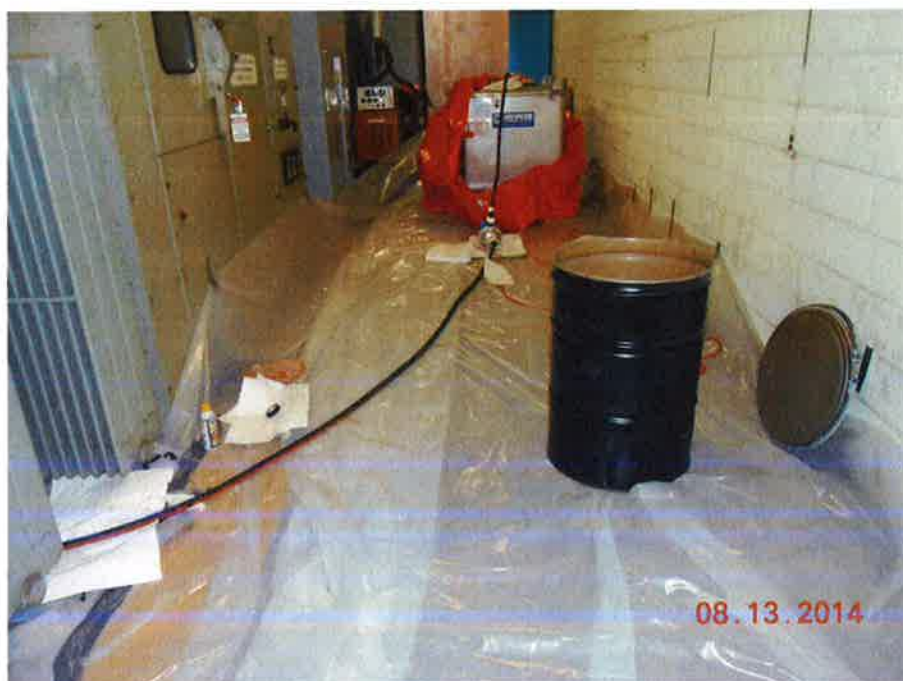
Transformer No. 3475167 during PCB oil removal.
